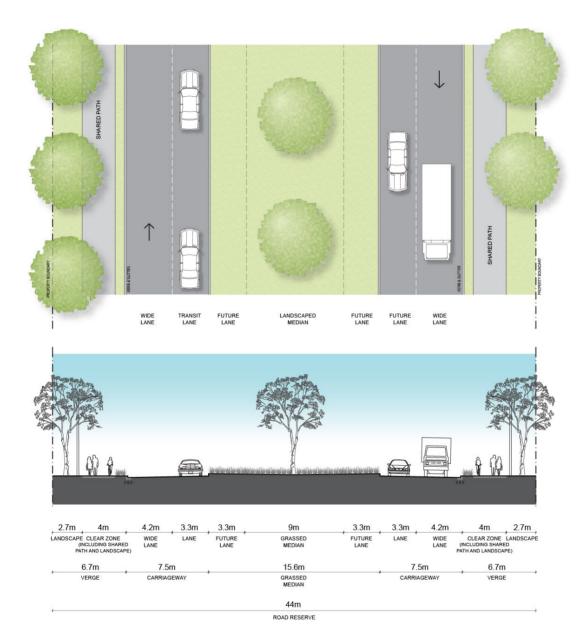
Transit boulevard cross-section (Schofields Road)
